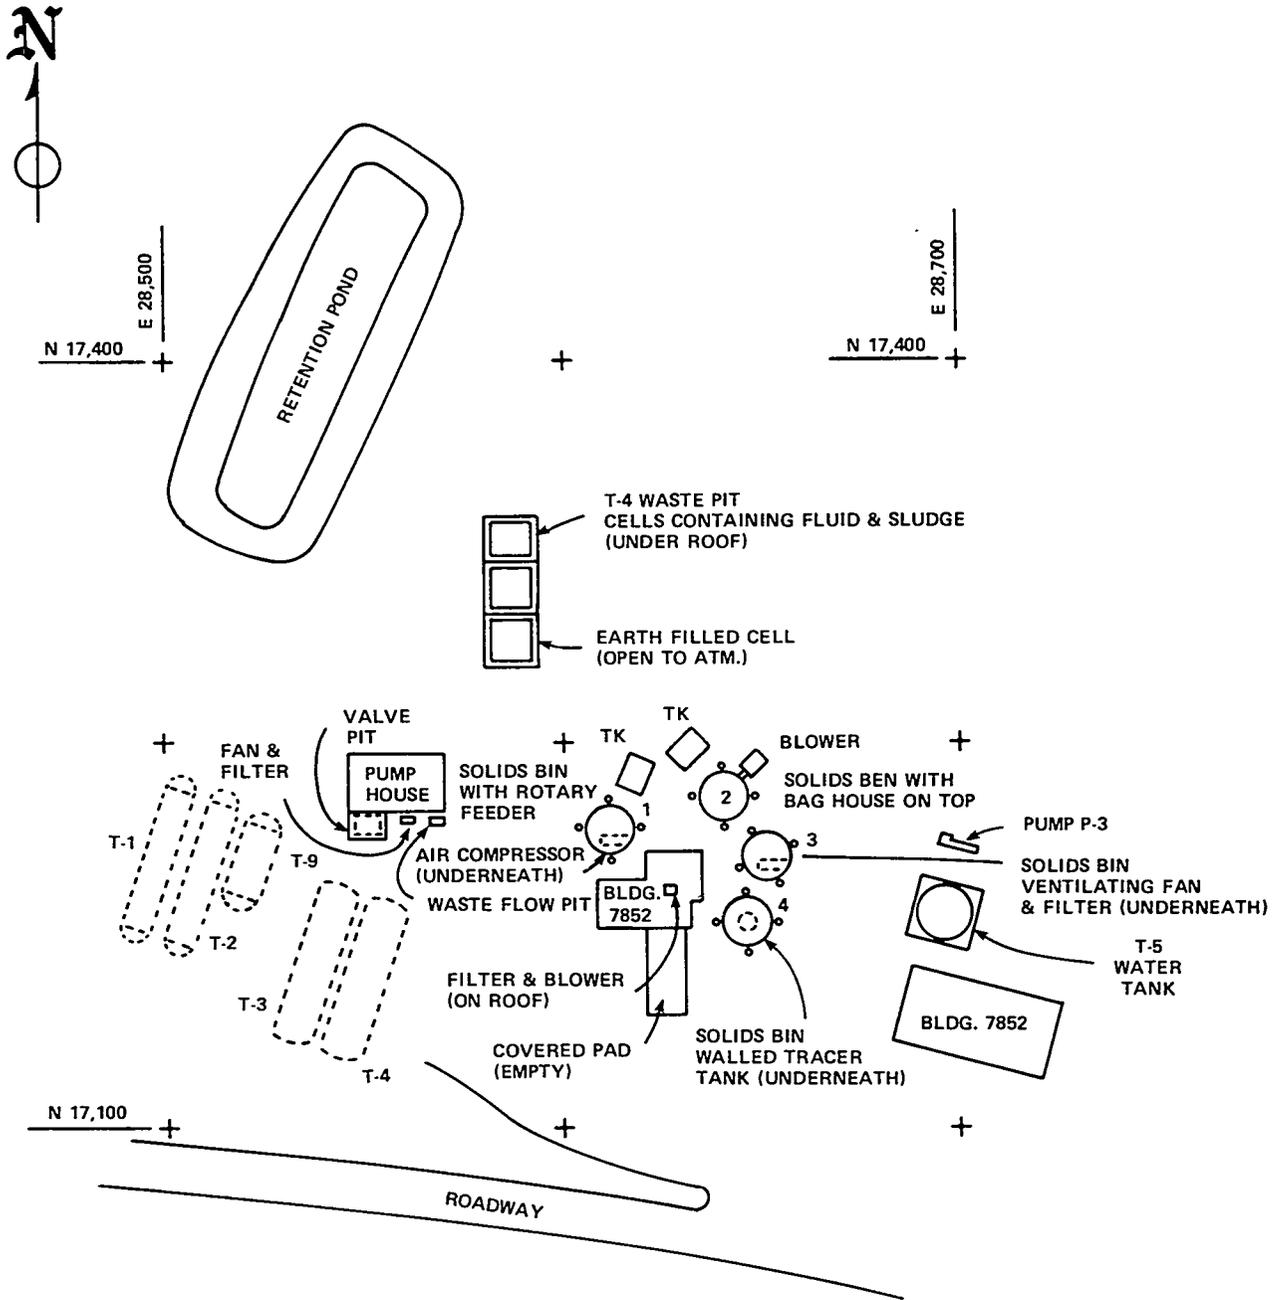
Site plan of the Old Hydrofracture Facility.
